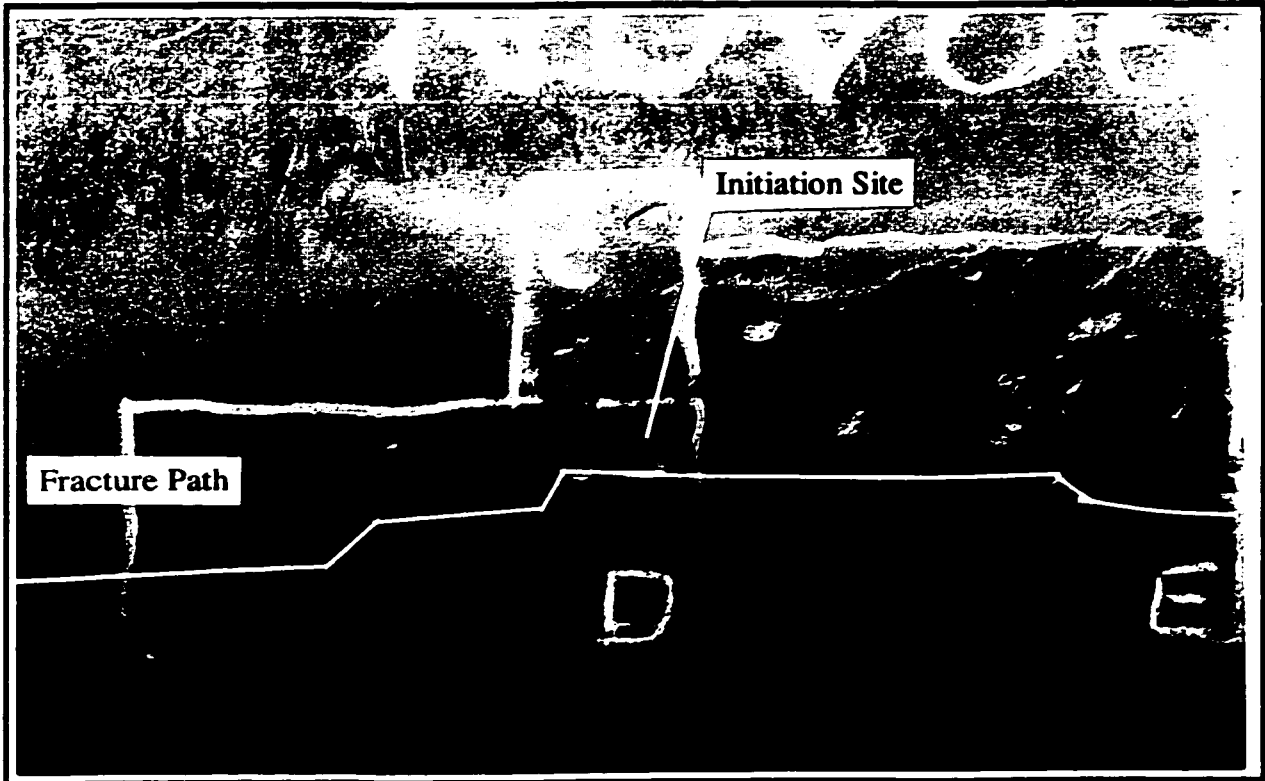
Failure location and fracture path for test NOV 06
